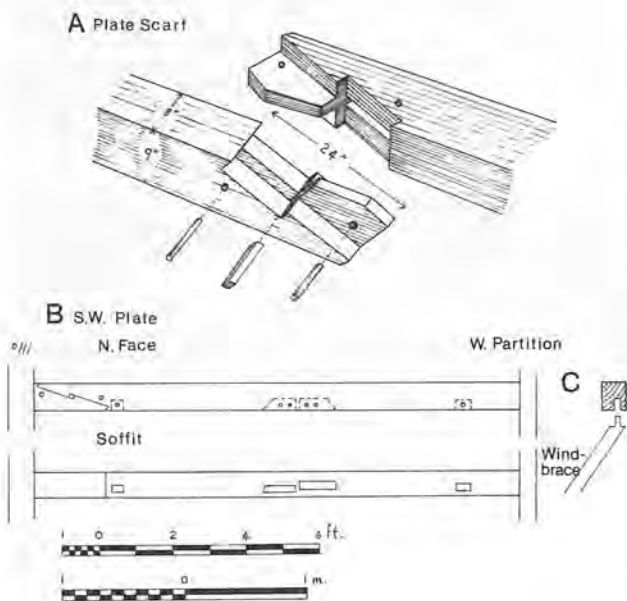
Hall House, Newland. South-west roof-plate and scarf-joint.
